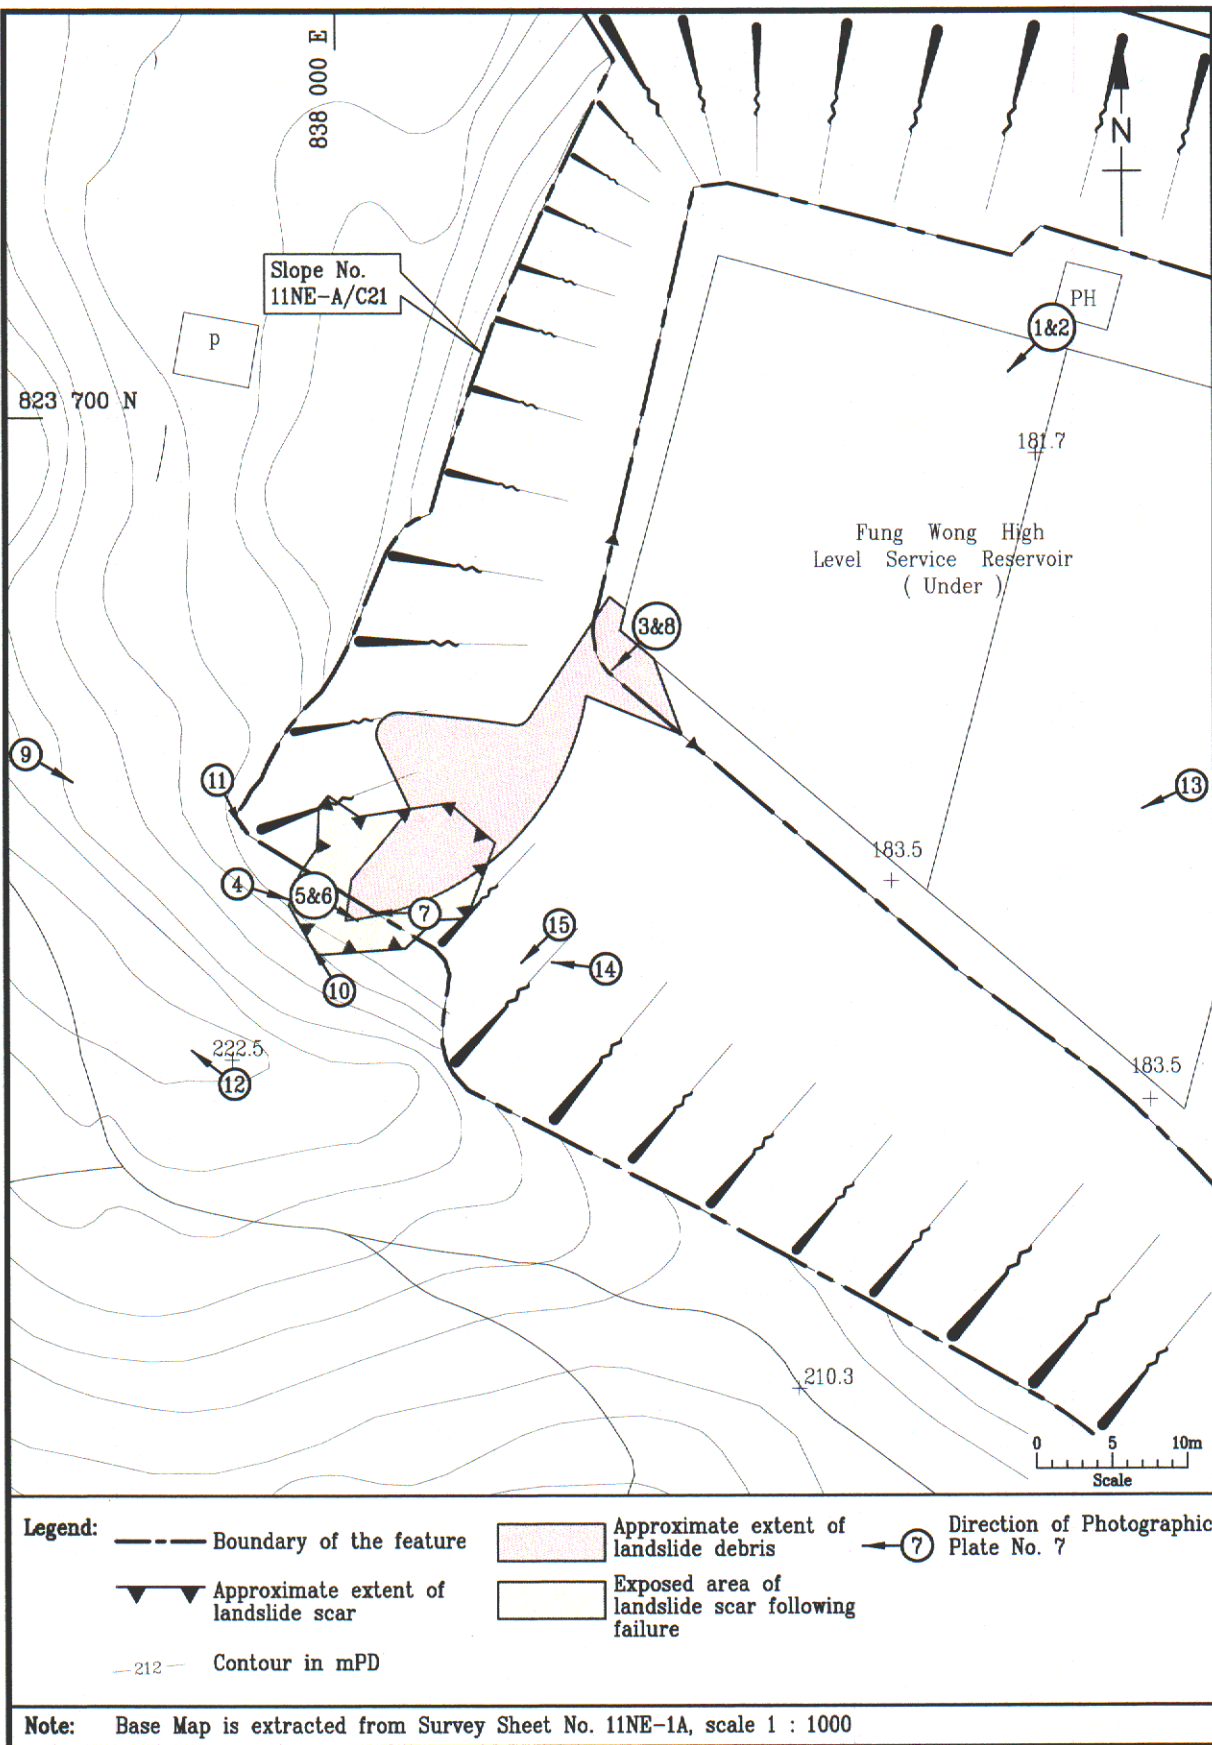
Plan of the Landslide Site Showing the Direction of Photographic Plates
